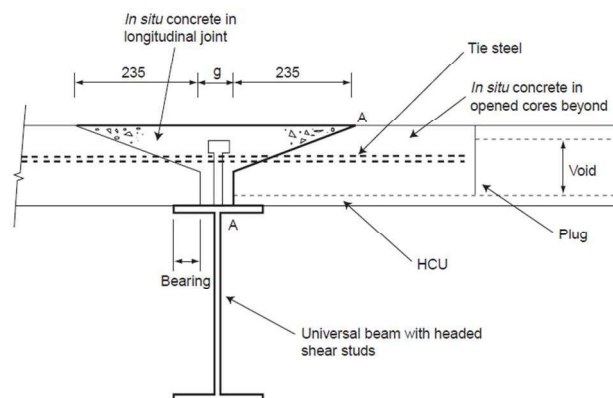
Details of precast in-situ joint of composite beam with hollow core slab units (D. Lam et al., 2000b)
